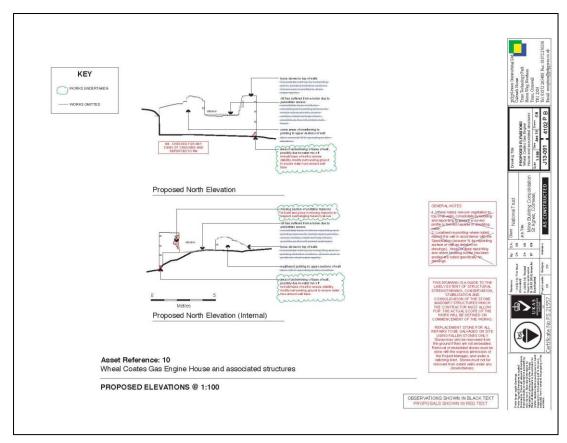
Internal and external northern elevations of Wheal Coates gas engine house.
